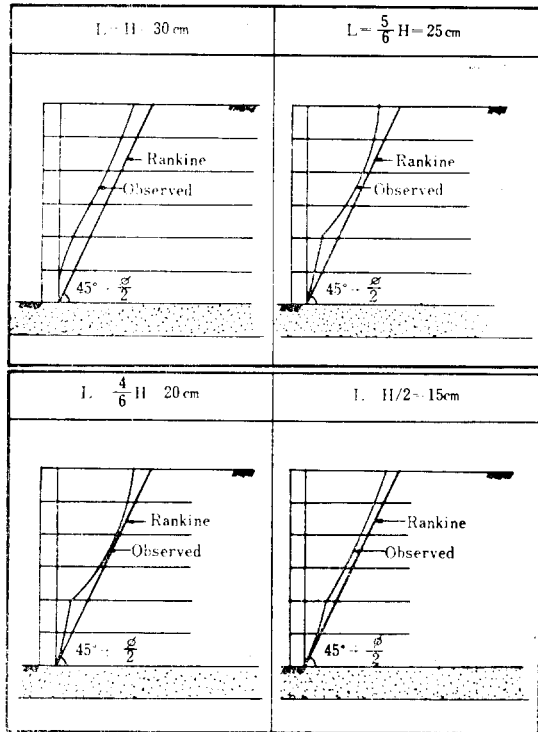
Observed failure surface of geotextile reinforced earth masonry walls
